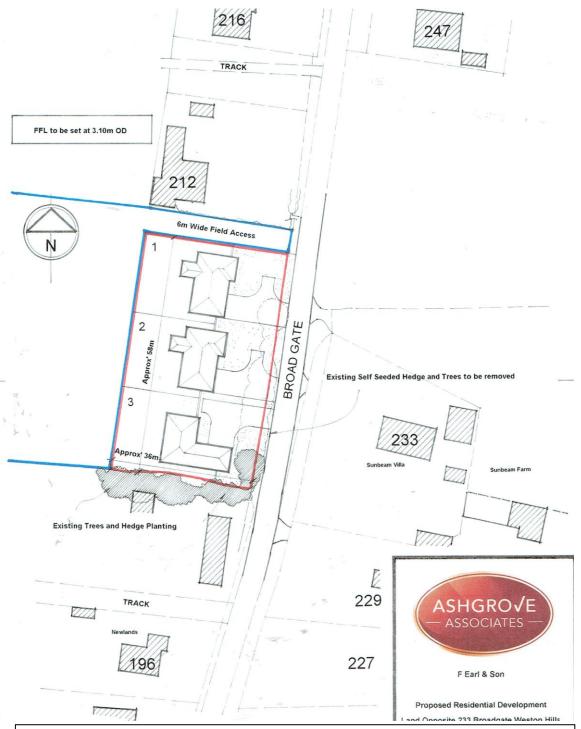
Block plan showing the proposed layout of the development site at an original scale of 1:500 at A3, (extract from Architects plan).
